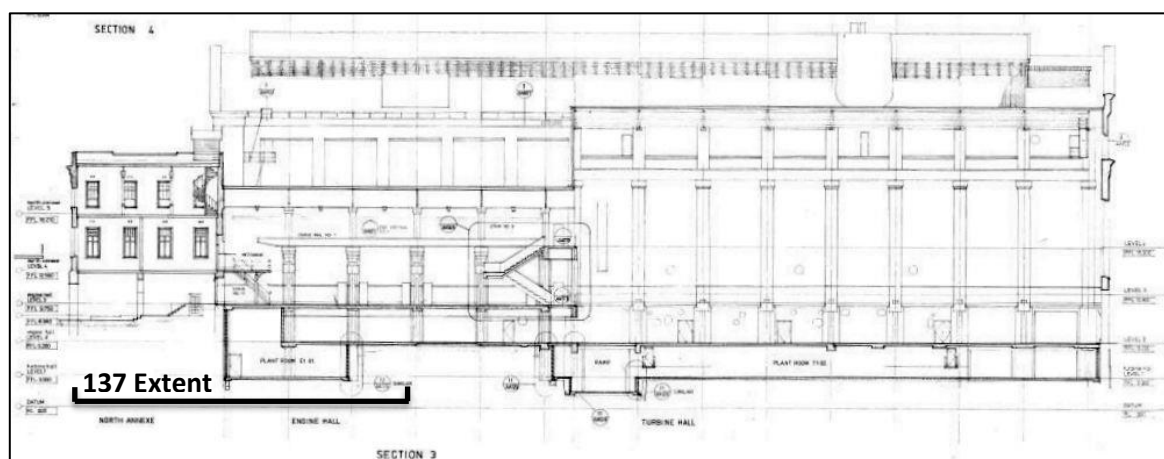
1984 MAAS Stage 2 Construction plan (Section 3) facing West, illustrating the basements beneath the North Annexe (the Office Building), the Engine Hall and the Turbine Hall (left to right). The basement of the Office Building is 4.28m and that of the Engine Hall is 6.75m at its deepest, and 2.48m in the shallower section. The approximate extent of 137 William Henry Street is marked.
